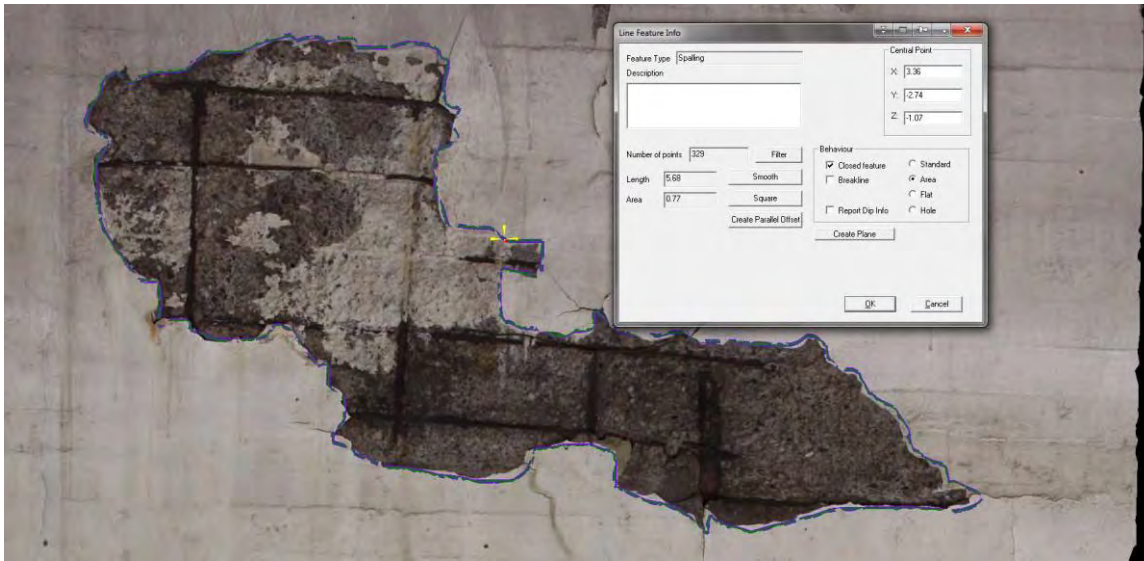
Typical survey of a spalling event in a final lining.
